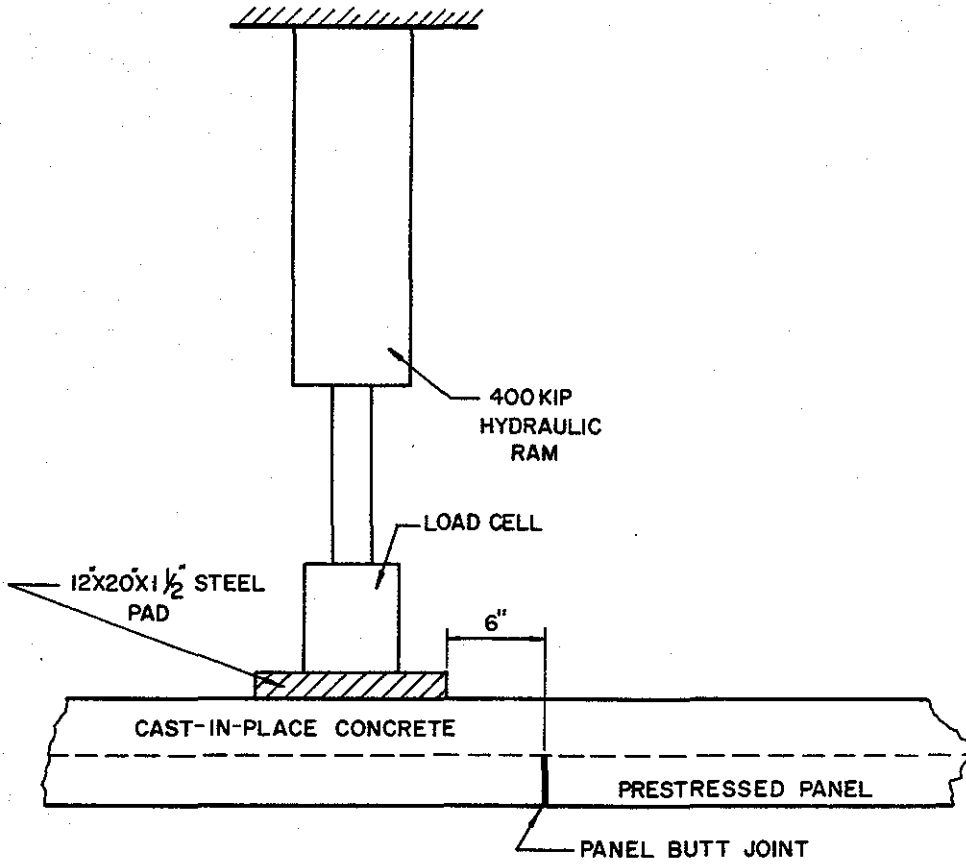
Hydraulic Ram and Loading Pad Arrangement for Static Failure Load Tests.
